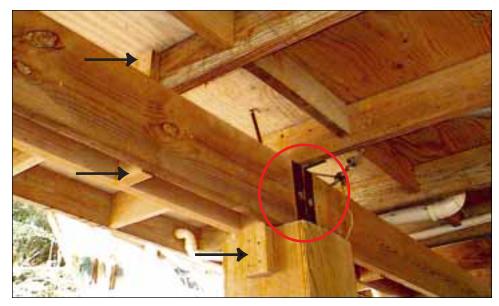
Example of an engineered connection between the floor beam and a concrete column (concrete column is enclosed in plywood). Vertical members (identified by arrows) provide continuous load path from floor joist to floor beams. Floor beams are connected to concrete columns with metal straps (circled). This house was located on the island of Culebra.
